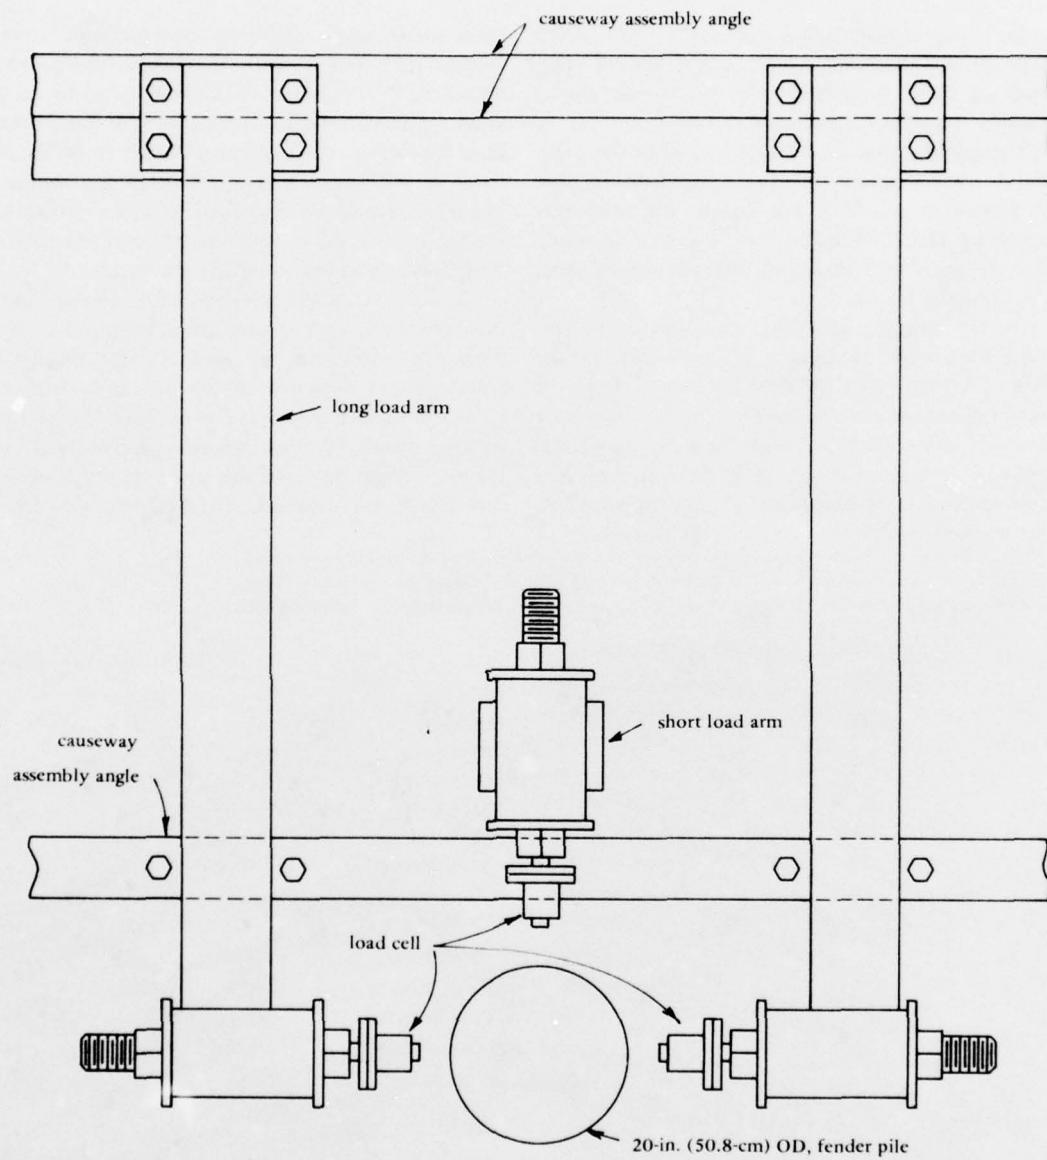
Load arm arrangement of each instrumented pile. Load cells are positioned to bear directly on pile prior to impact tests.
